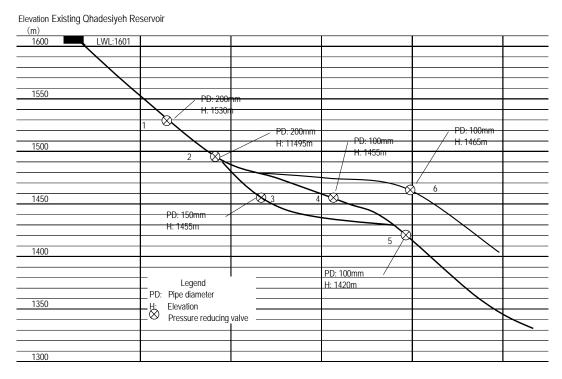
Location of Pressure Reducing Valve (Qhadesiyeh)
